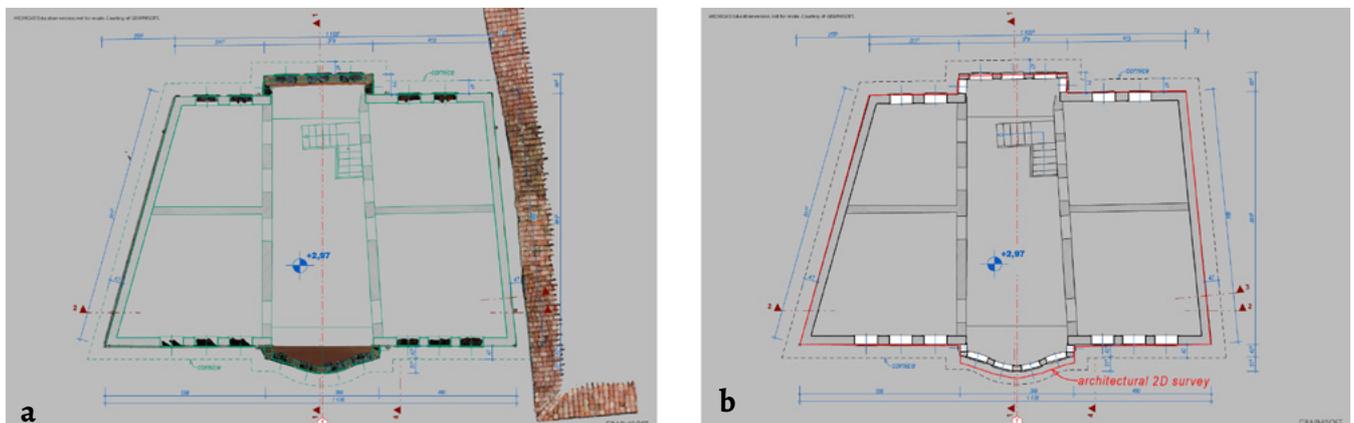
Second storey floor plan drawings – generated from the 3D Architectural BIM in ArchiCAD: *a)* with deliberately coloured contours, superimposed over the cut point cloud from the photogrammetric 3D survey; *b)* standard workflow view with an overlaid contour of the architectural 2D survey.
